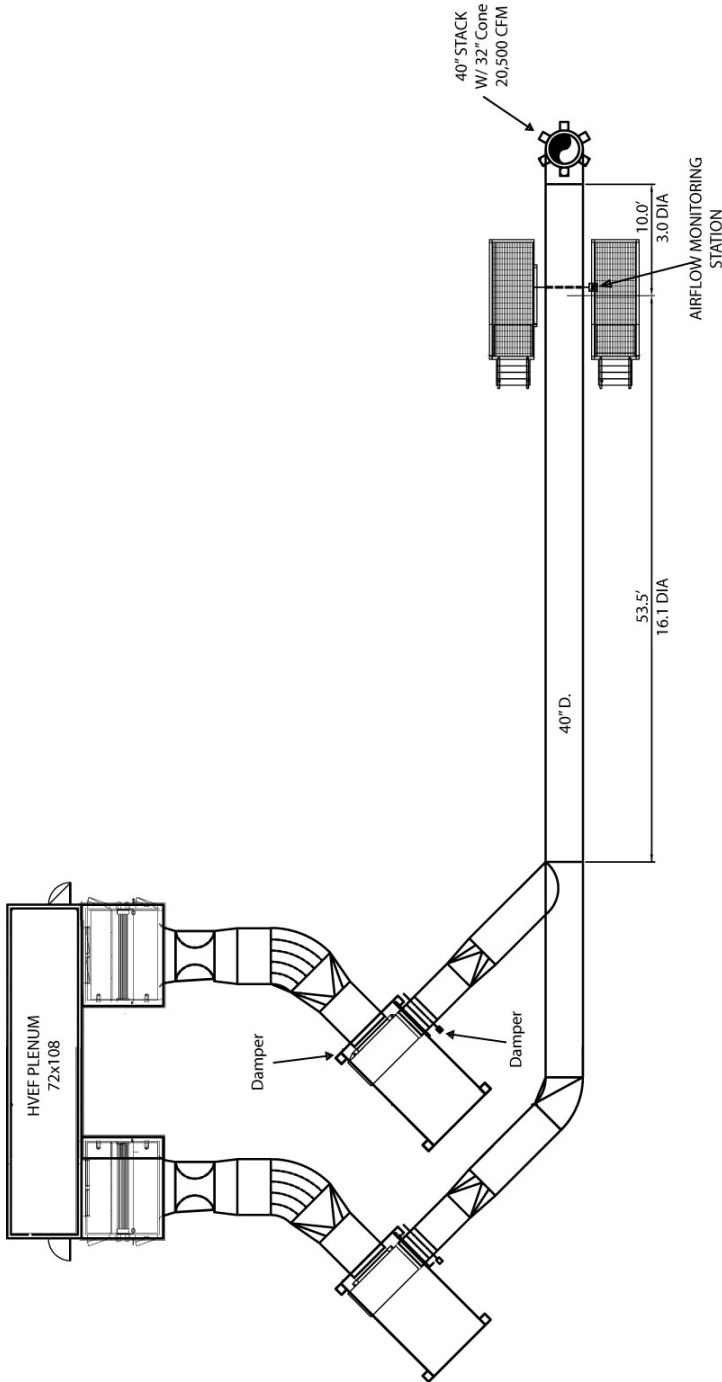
Plan View of the 3410 Building Filtered Exhaust Stack
